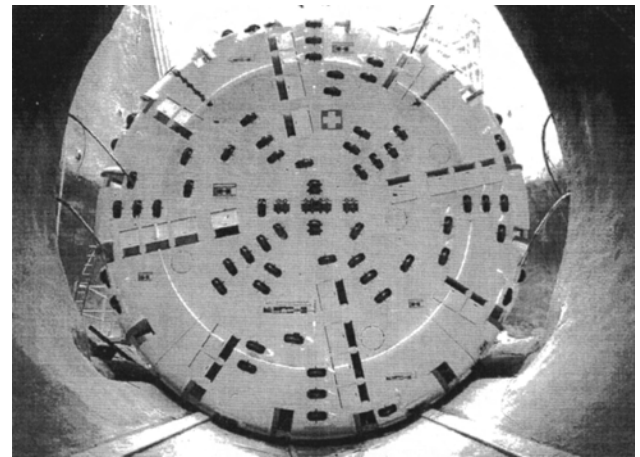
Tunnel boring machine cutter head with muck bucket scraper slots (courtesy of Herrenknecht AG)
